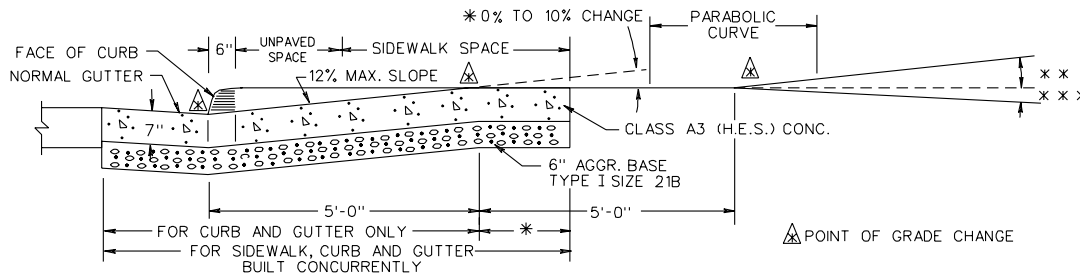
DETAIL TO BE USED WHEN THE COMBINED WIDTH OF UNPAVED SPACE AND SIDEWALK SPACE IS LESS THAN 7'.
